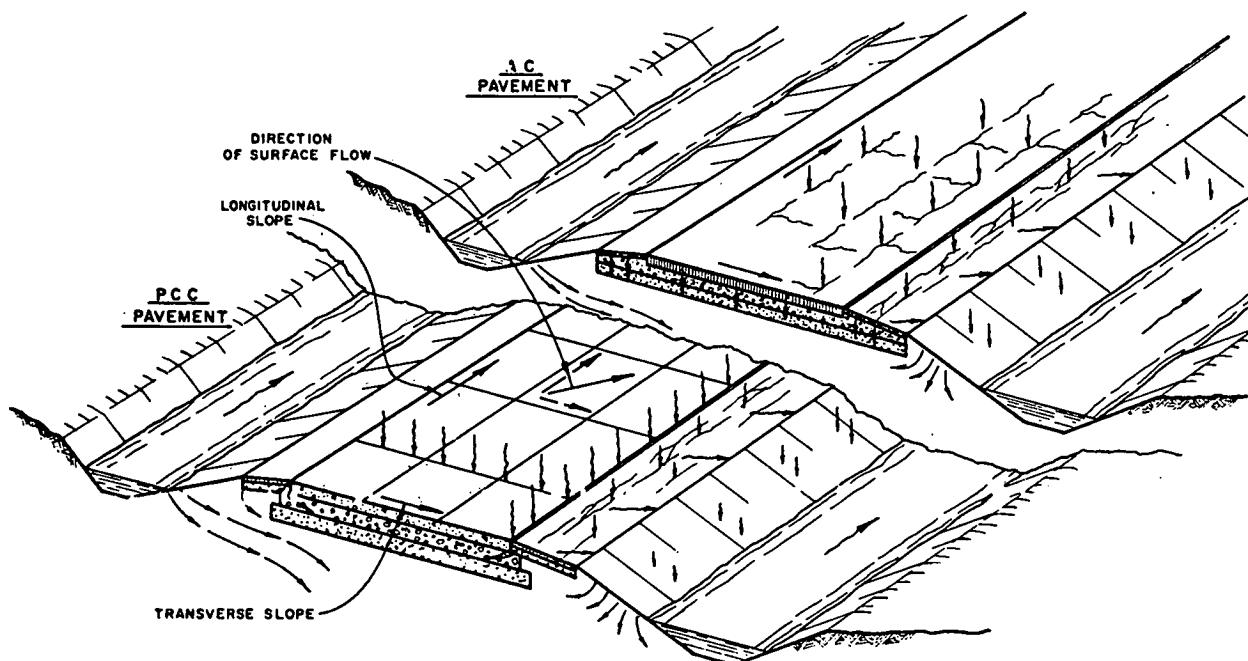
Points of entrance of water into highway pavement structural sections (10).
